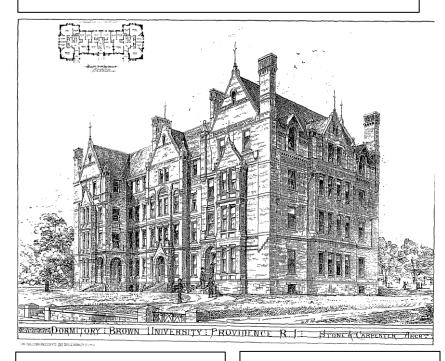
(above) Stone & Carpenter winning original facing plan for Slater Hall (American Architect 394)
